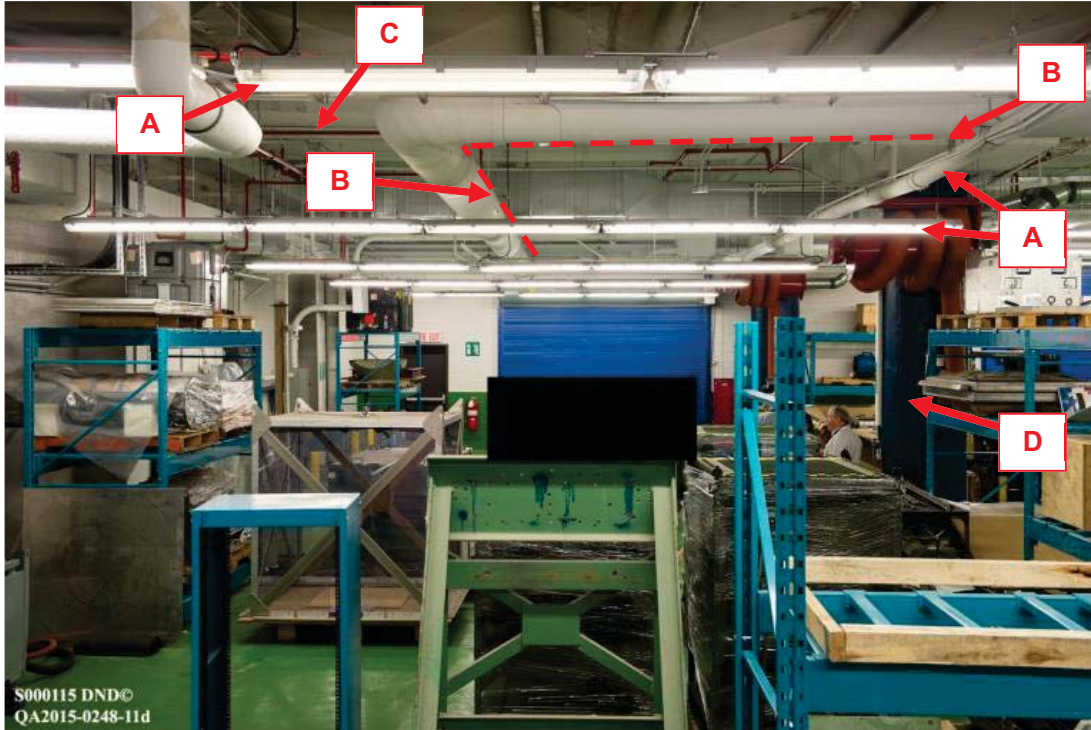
Proposed ECC/SRS installation area in the QETE VTL. View is from the west looking east.
